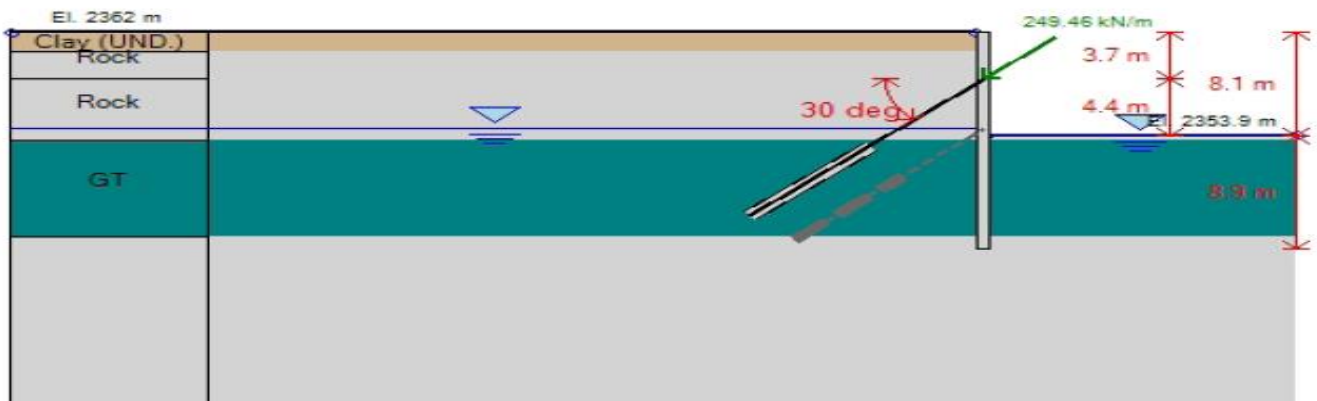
the next 3.9m excavation for 1.5 m spacing and 1<sup>ST</sup> anchor level 3.7m
